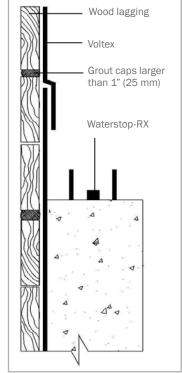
Voltex installed directly to wood lagging with gaps filled. (Cast-in-place concrete wall)
